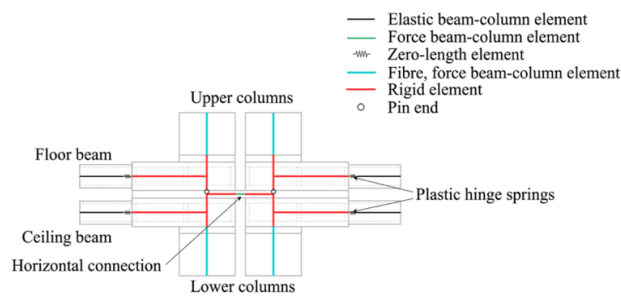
Connections modelling approach. (Morsy et al., 2024)
